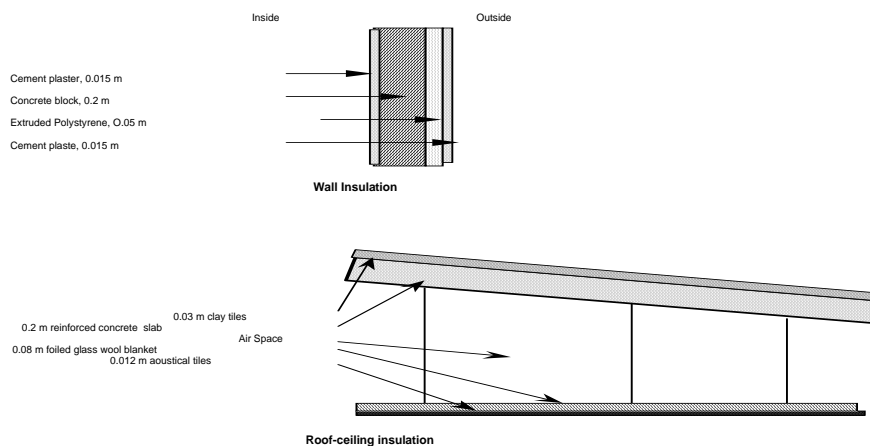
Walls and roof ceiling after applying thermal insulation.
